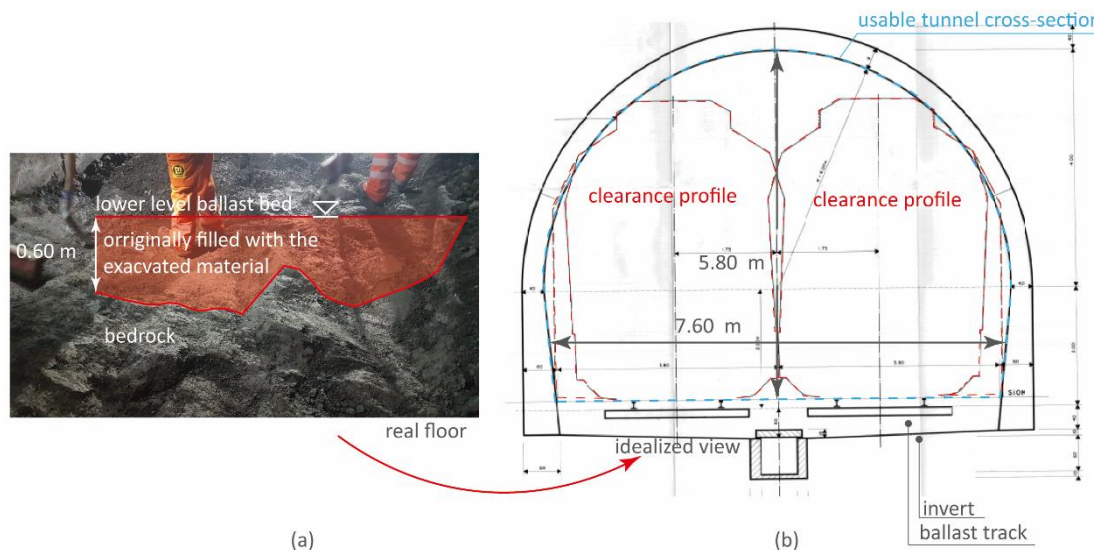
Tunnel floor under the ballasted track in an existing tunnel, built in 1913, Switzerland.
